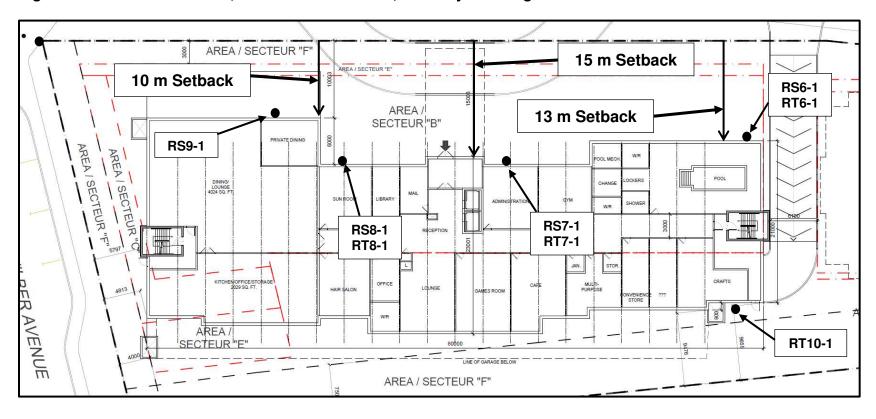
Ground Floor Plan, 175 Richmond Road, 6-storey Building
